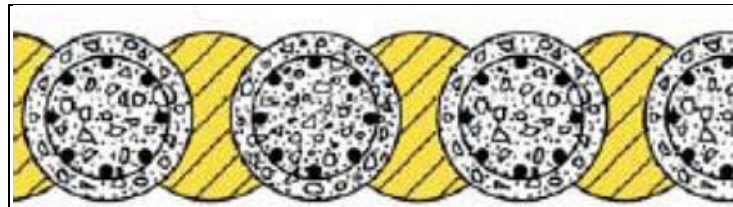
Pile wall-Secant hard/soft cross-sections [12]
